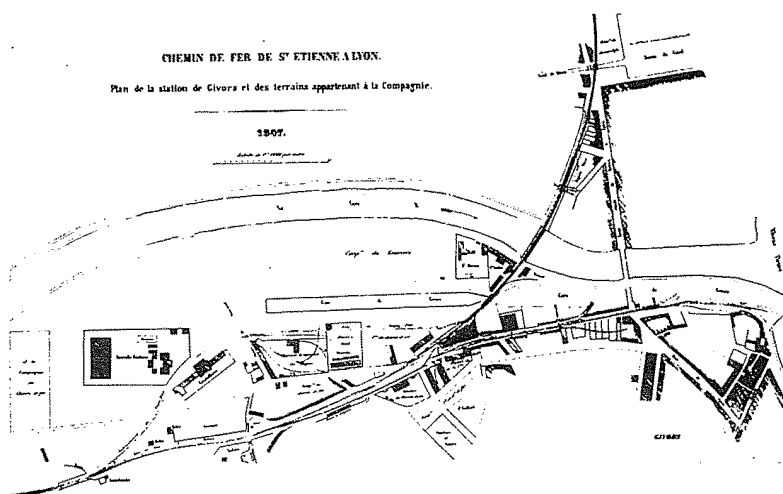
, Plan of the Givors railway station in 1847, with port and industrial zone (D.A.A. 41J)
